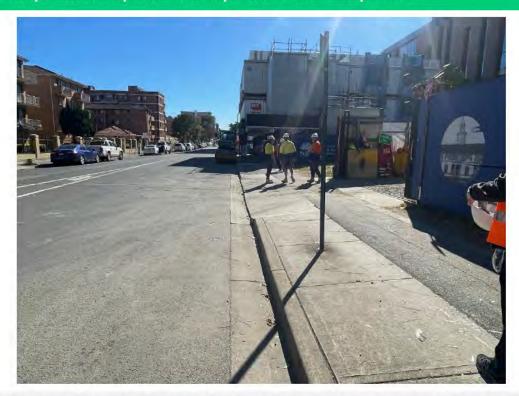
Main vehicle gate on Goulburn Street, showing a generally clean pavement and rumble grid on the inside of the hording.
